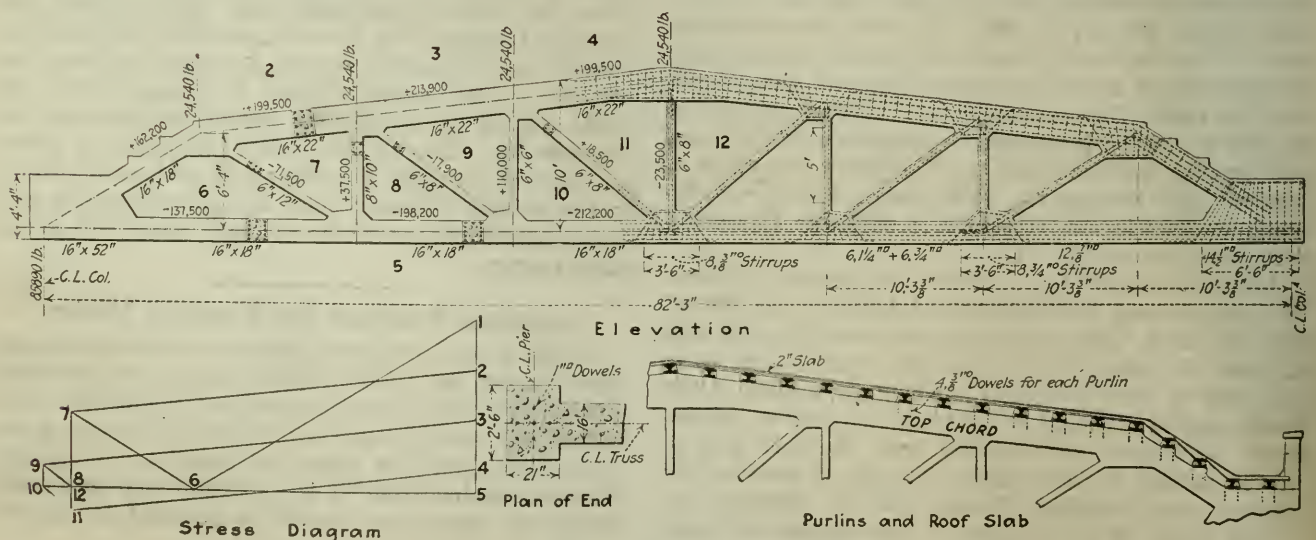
DESIGN OF CONCRETE ROOF TRUSS
